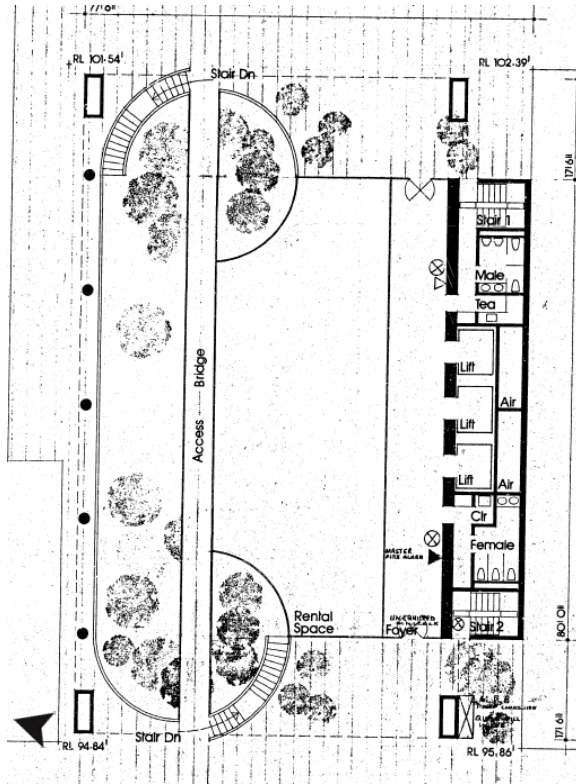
Ground floor plan, stamp dated 1974 (BAP).
